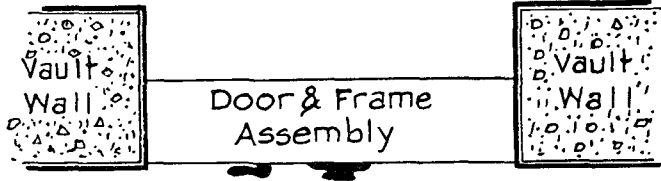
Installation without Grouting. Frame Fits Fairly Snug into Masonry Opening.
